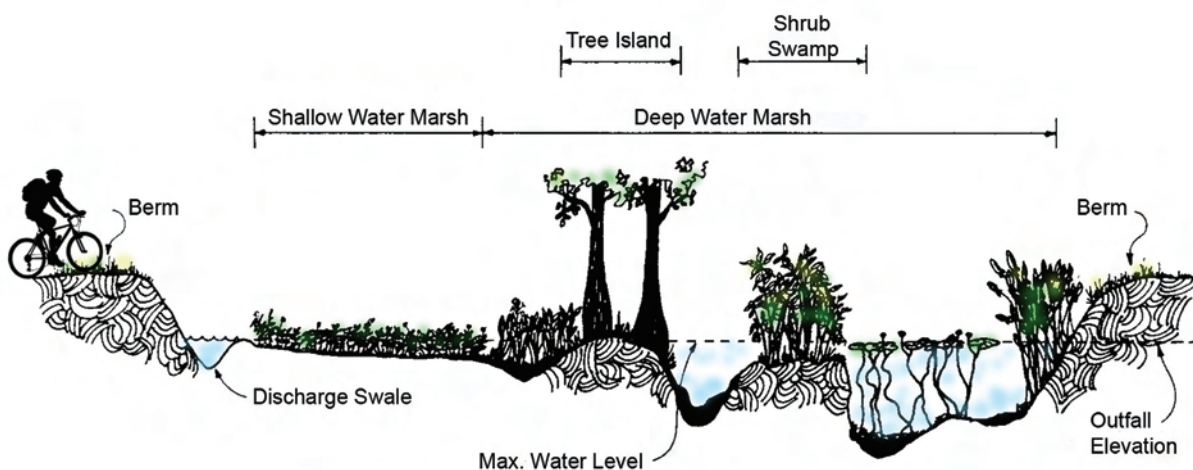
Cross-section of a typical constructed stormwater treatment area. Source: Mark T. Brown for Atkins
